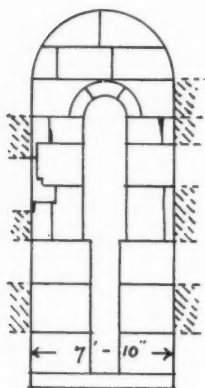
ELEVATION OF NORTH WALL OF NORTH-WEST CHAPEL.
